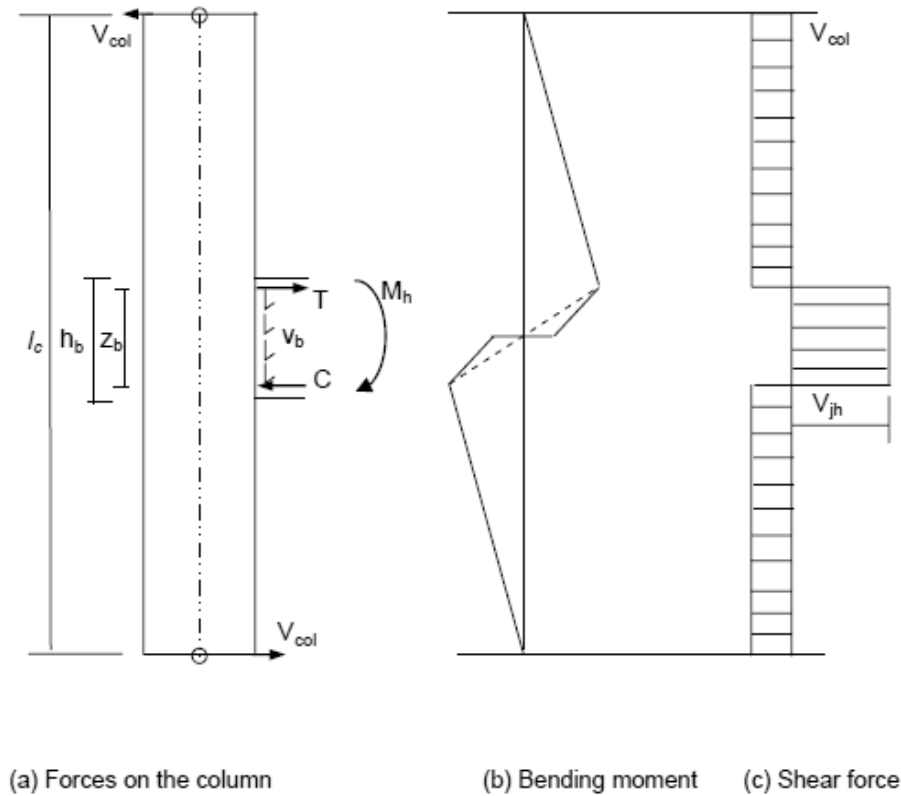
Forces Acting on Exterior Joints (Uma and Prasad 2006)
